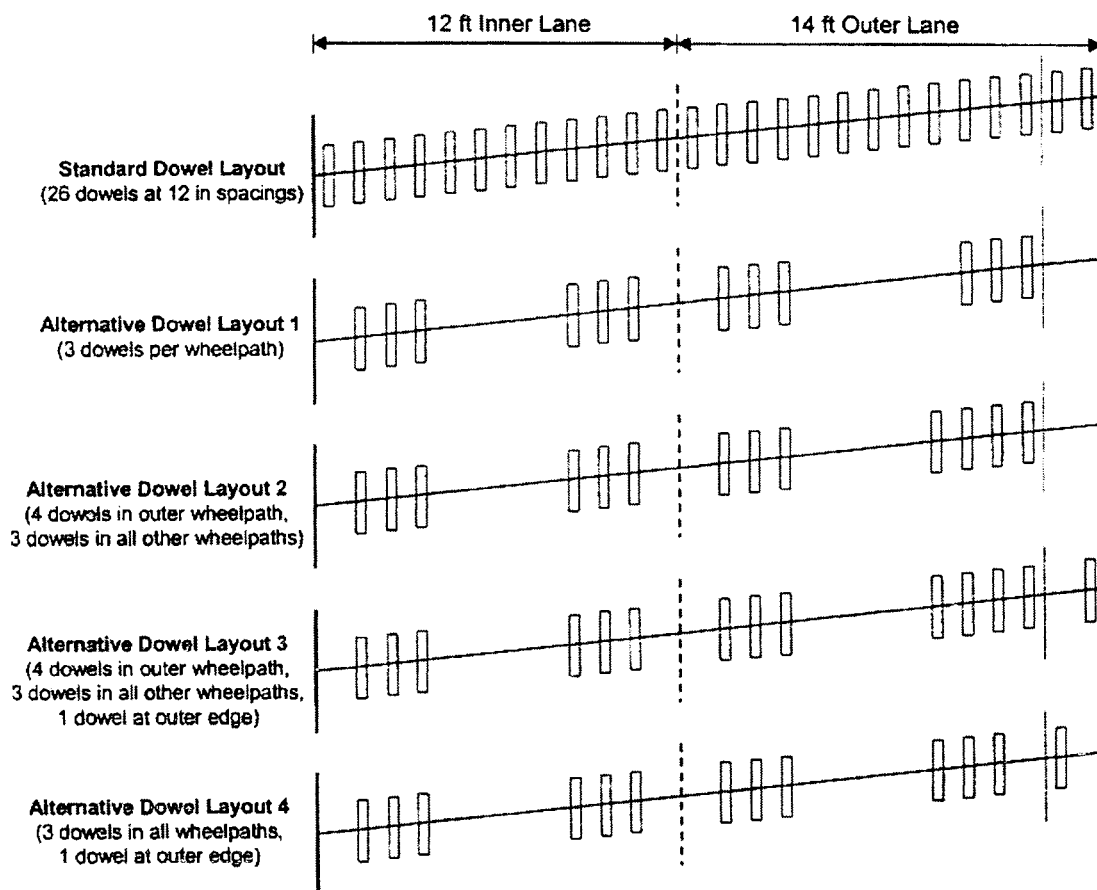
Alternative dowel bar layouts for Wisconsin 2 and Wisconsin 3. [19]
